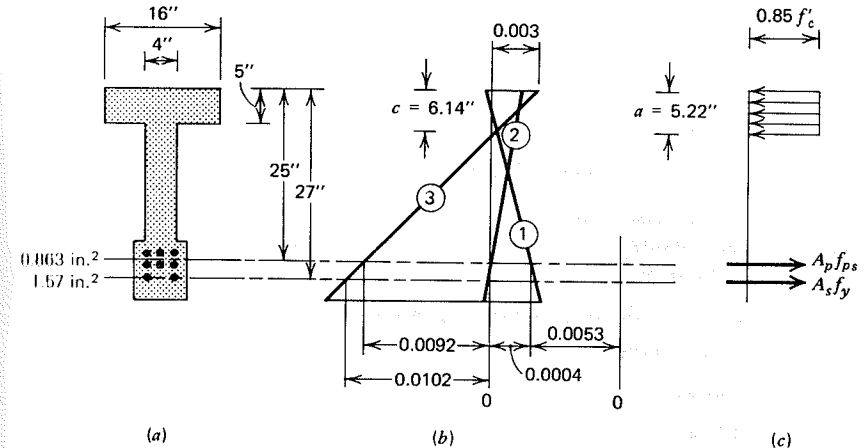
Flexural strength analysis of partially prestressed T-beam. (a) Cross section. (b) Concrete and steel strains. (c) Stresses at failure.
